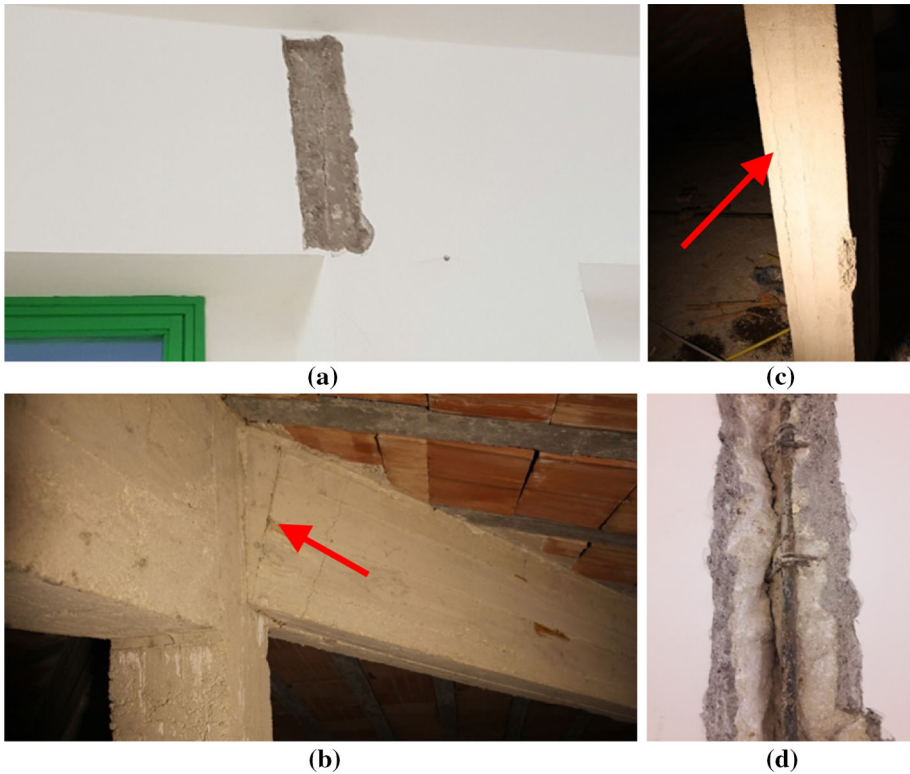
Cracking failure at the end of beams (a, b) and columns (c). Smooth bars with poor transverse reinforcement (b)
